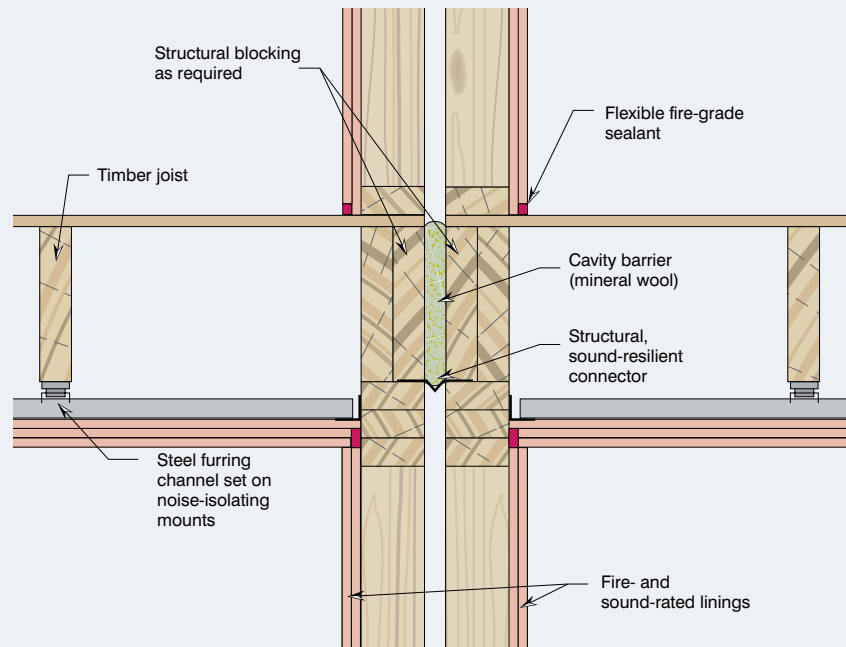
Discontinuous floor joist and floor sheathing – elevation view.
